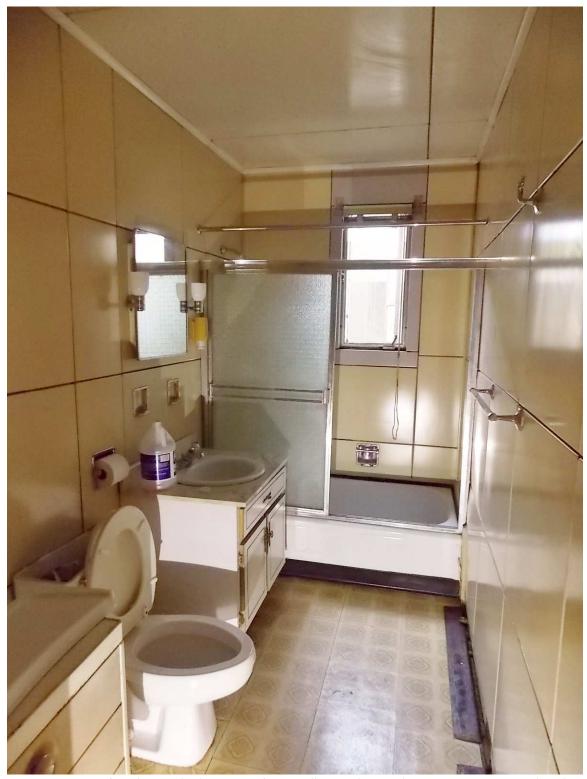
View of Bathroom looking west from Hallway, photo taken June 2017. Note the glass shower doors which have been added.
